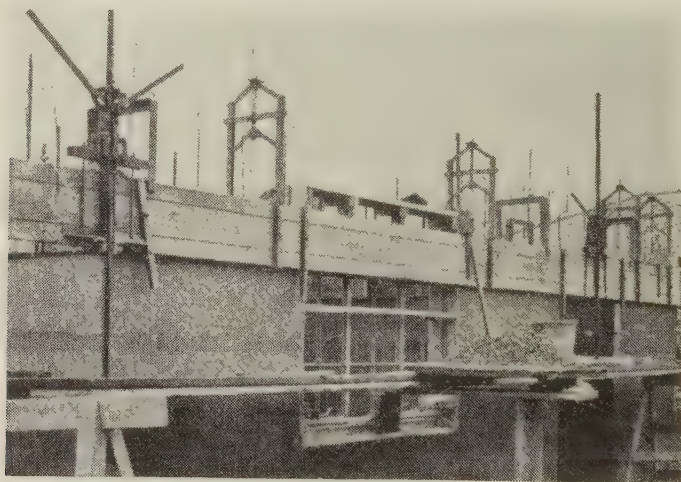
SLIDING FORMS USED IN BUILDING CONCRETE COTTAGES, ENGLAND
